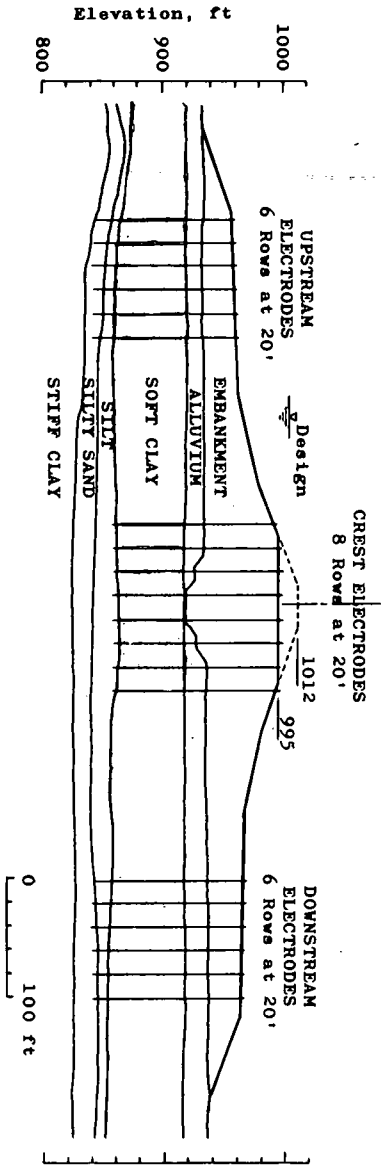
CROSS-SECTION OF WEST BRANCH DAM AND FOUNDATION, SHOWING LOCATIONS OF ELECTRODE ROWS
